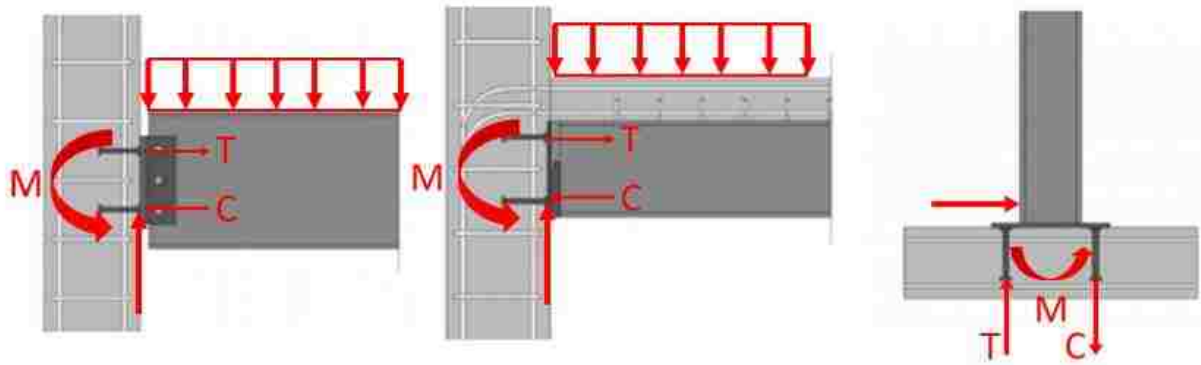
Example steel-to concrete joints (*Design of Steel-to-Concrete Joints Design Manual II*)
